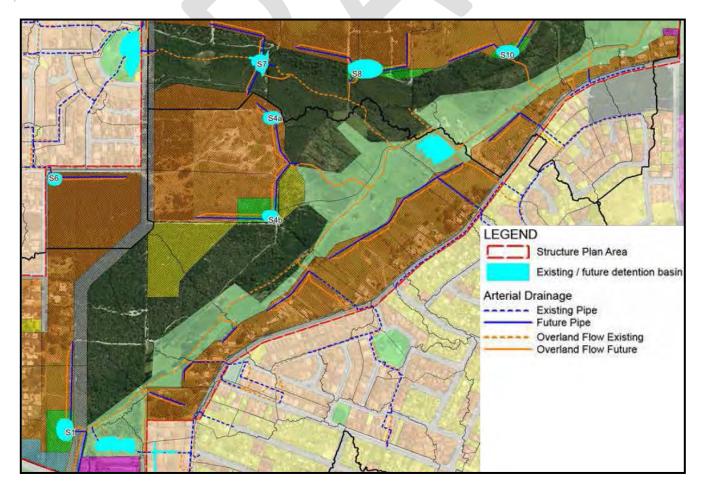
ARTERIAL DRAINAGE PLAN - SOUTH (ENVIRONMENTAL E., 2014)
